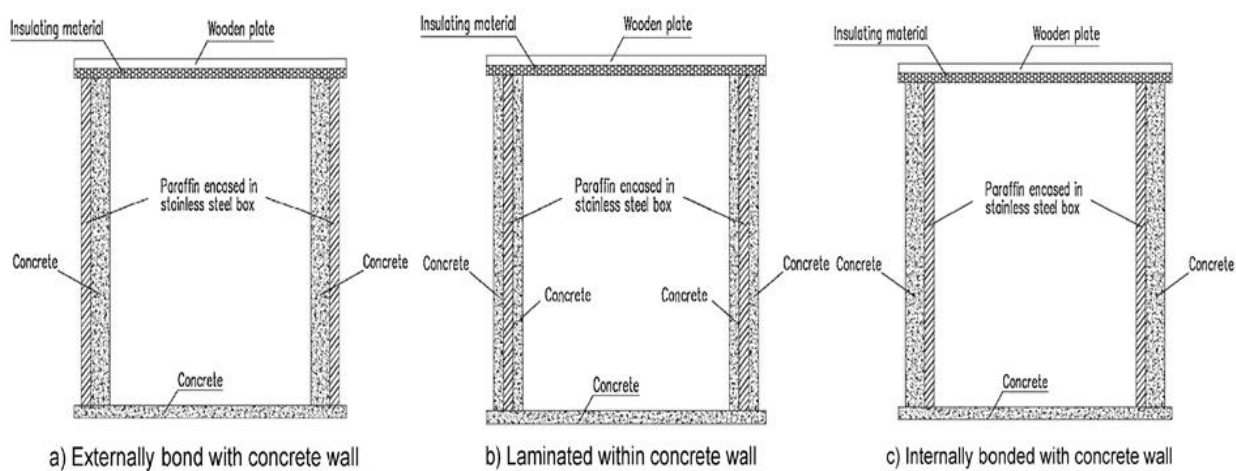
PCM layer: (a) Externally bond with concrete wall, (b) Laminated within concrete wall and (c) Internally bonded with concrete wall [100]
